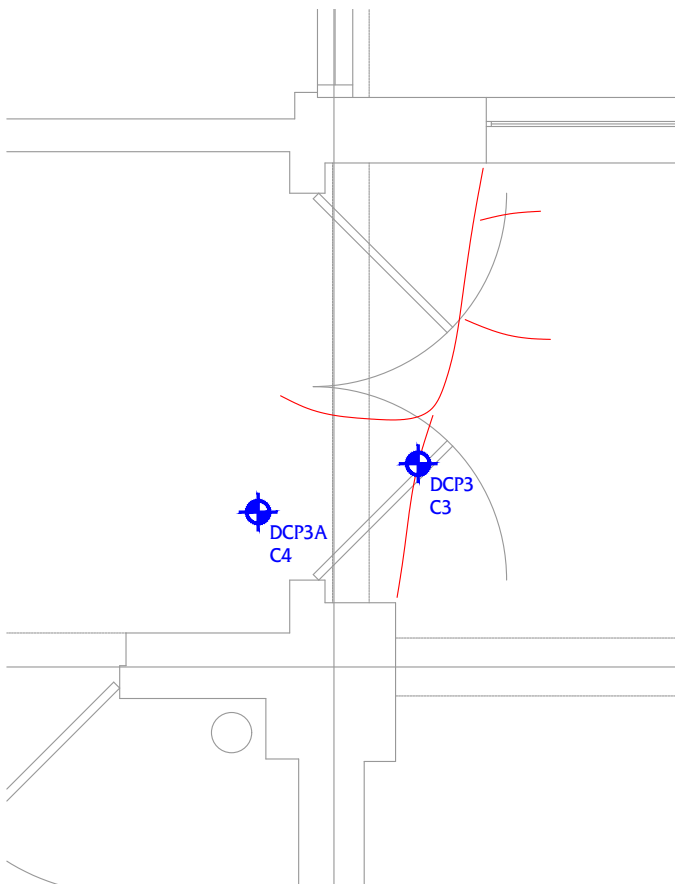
PART PLAN OF GROUND FLOOR SHOWING NEAR SURFACE REINFORCEMENT ARRANGEMENT AND DCP LOCATION - SURVEY AREA GS2 SCALE 1:20
